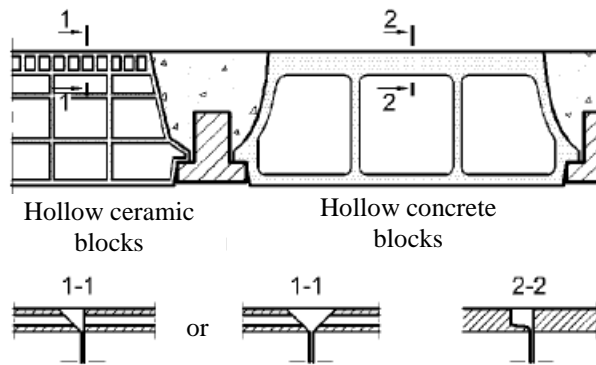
Structural solution for a floor slab with “discontinuous” concrete footing
